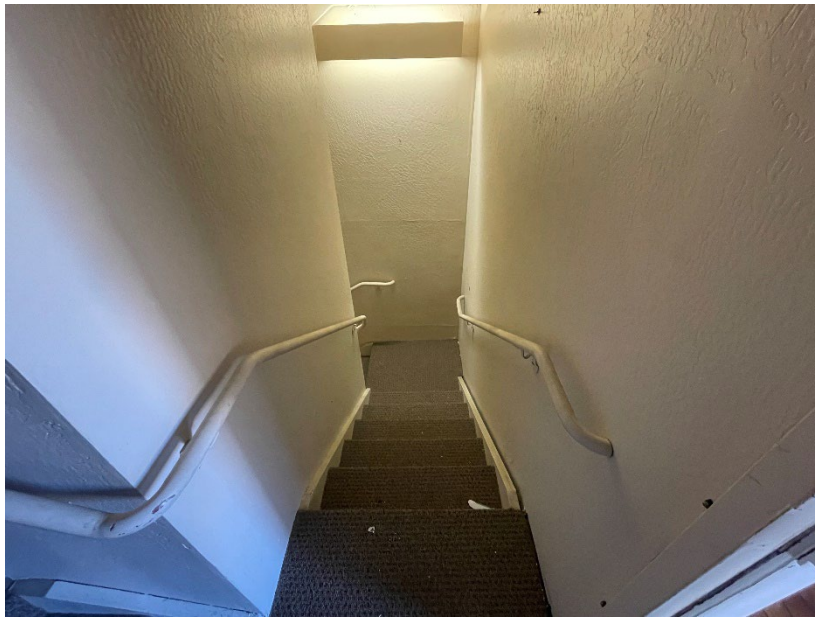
Typical non-historic stair well, floors one through roof. (Photo taken by P&T 03/14/2025)
